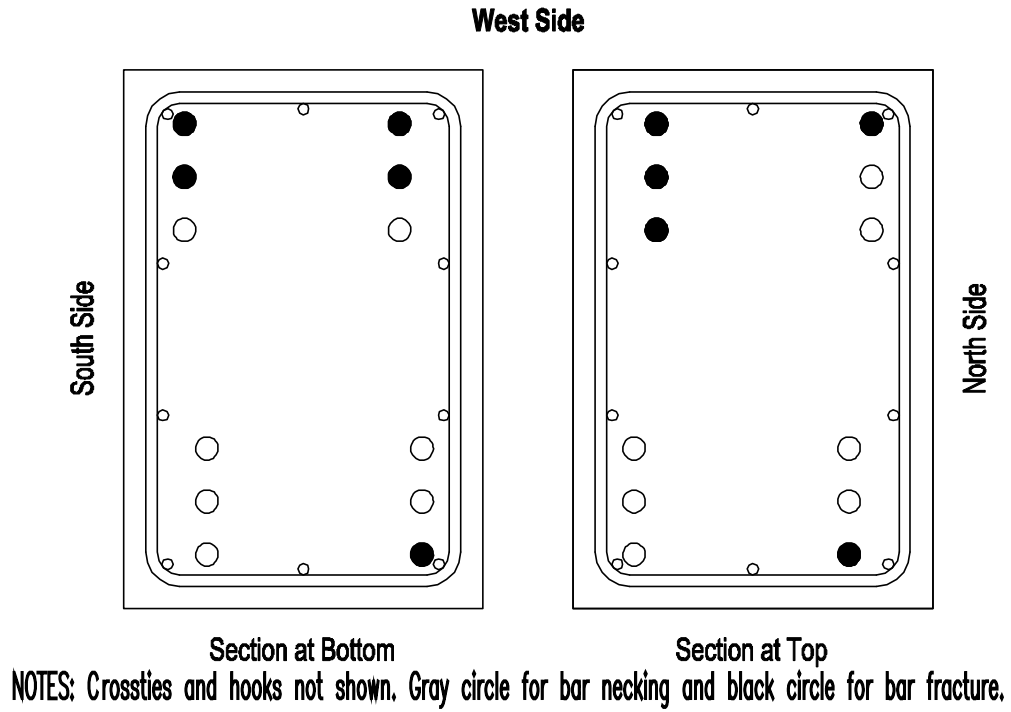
Reinforcing bar fracture locations, D80-1.5
